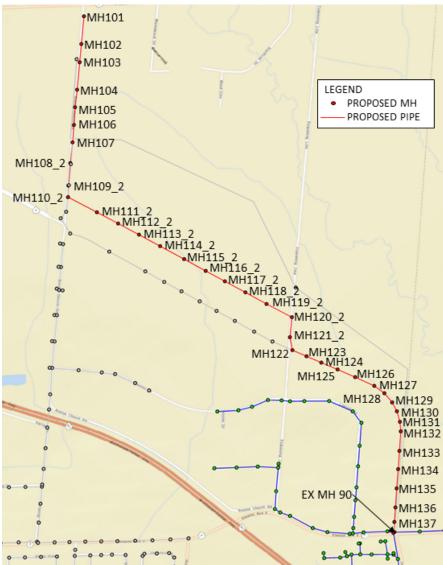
and Figure 6-3 show the new pipes and manholes added to the model for each option.
